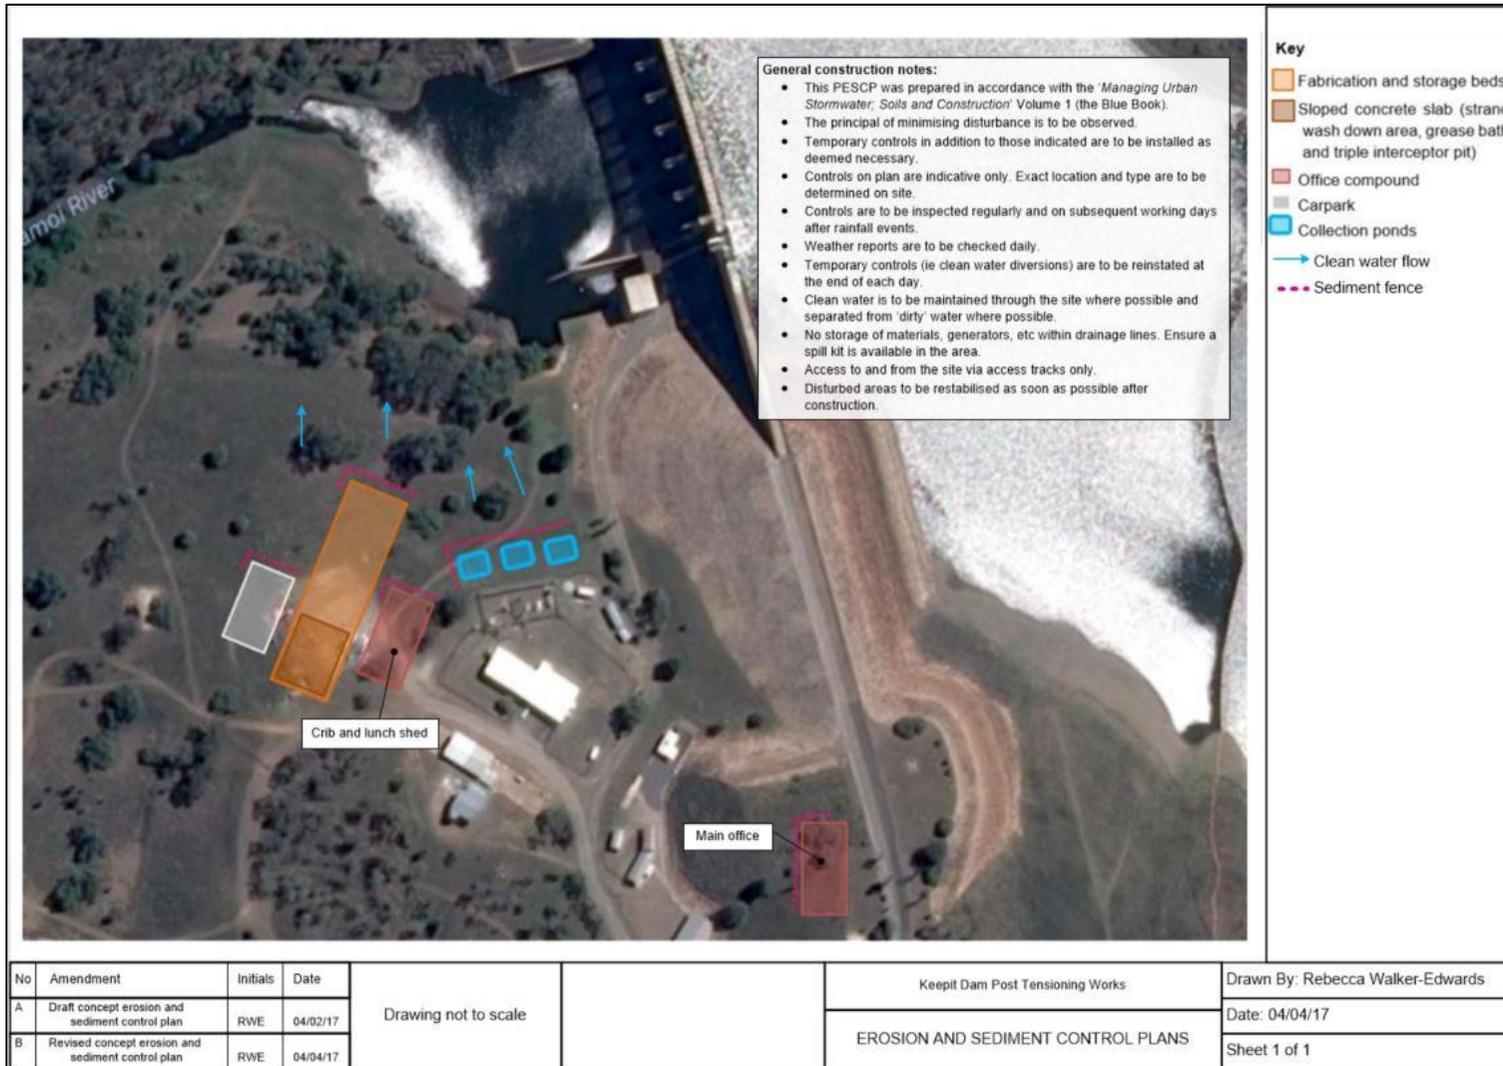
Concept erosion and sediment control plan. \*Sediment fence around collection ponds was not required.
